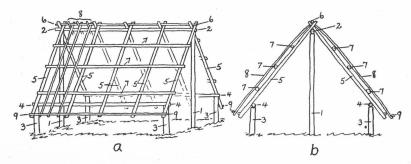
House framework, a, side view; b, end view: 1, supporting posts of ridgepole (pou); 2, ridgepole (tahuhu); 3, wall posts (pou); 4, wall plates (hapai); 5, principal rafters (oka); 6, upper ridgepole (tamaiti); 7, purlins (torotoro); 8, thatch rafters (rau oka); 9, eaves rod (torotoro hiohio).
